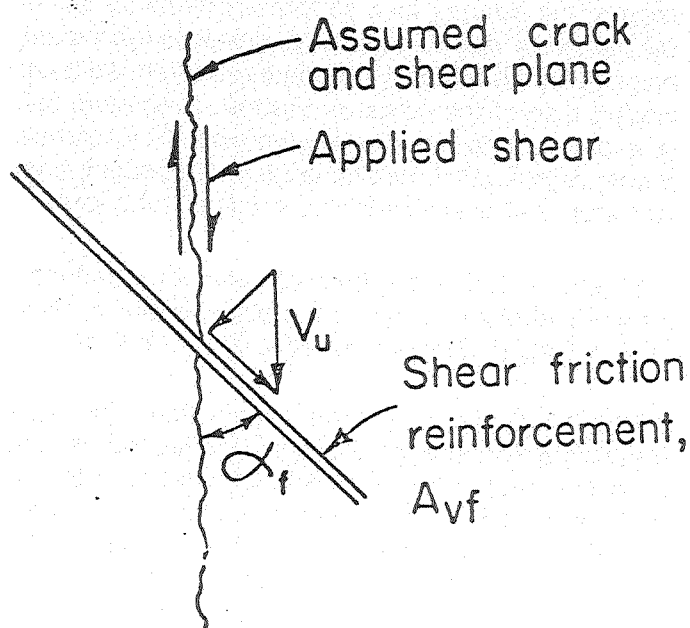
Shear-friction reinforcement at an angle to assumed crack
